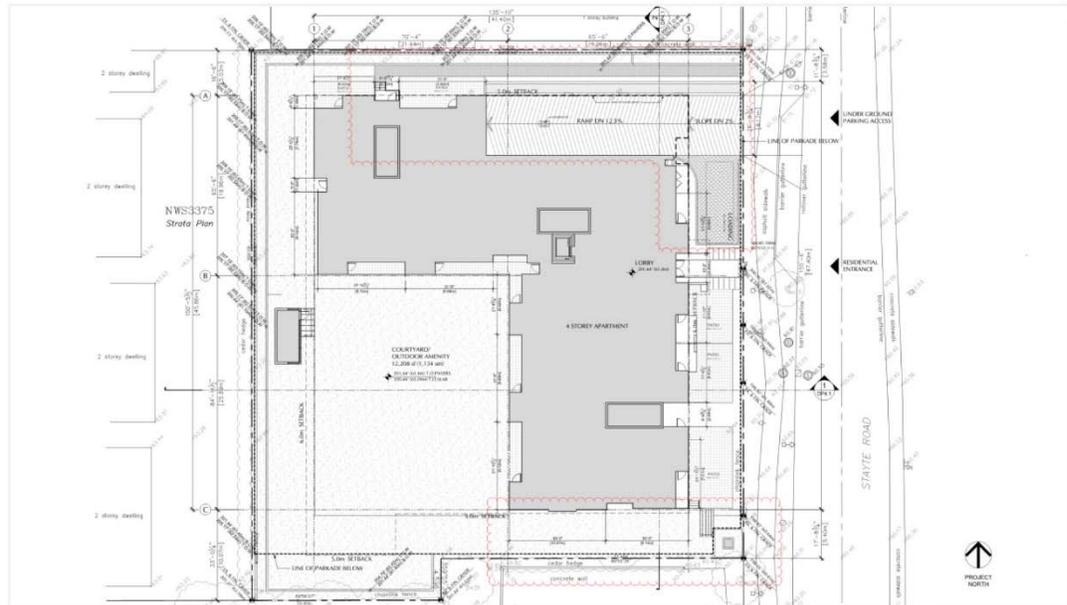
Proposed Development Site Plan with New Location of Future Driveway (December 17, 2019)
